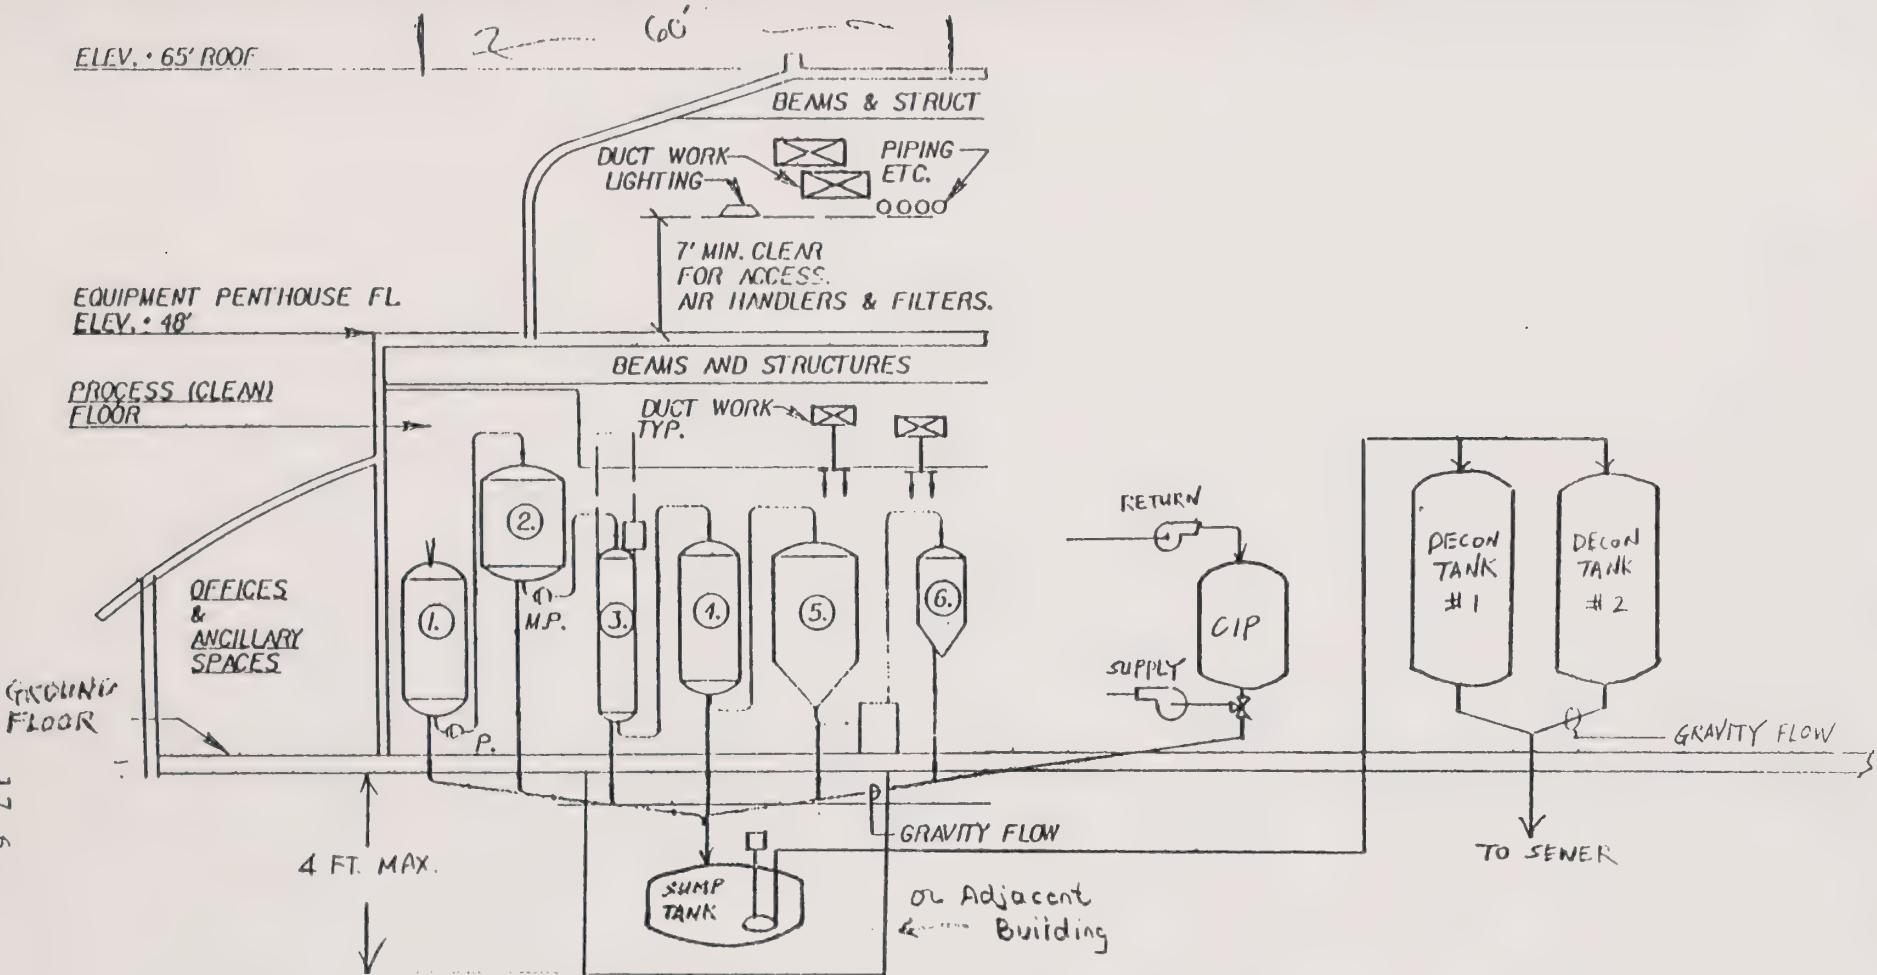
UNDER-GROUND SUMP TANK SYSTEM
